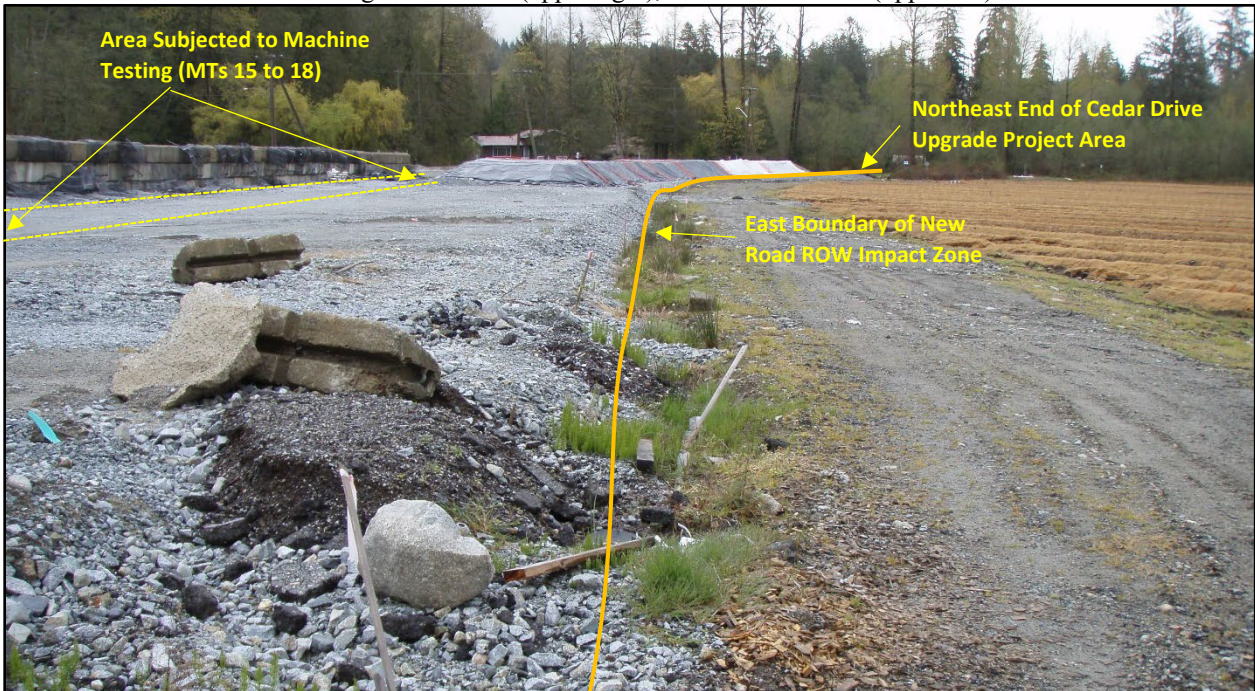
An April 13, 2022, general view of the northeastern end of Development Area 7 showing the new road ROW (left), and section that was subjected to machine testing (MTs 15 to 18) (see Figure 25), looking northeast. Additional placement of fill on the new road ROW (left) to match the height of the very northern section (upper-center) will occur in mid-2022. Note that the new farm access road constructed with imported sand/gravel fill in 2021 and lies immediately east of the study area boundary. It allows farm vehicles to travel along the western edge of the blueberry field without sinking into saturated boggy organic-rich deposits.
